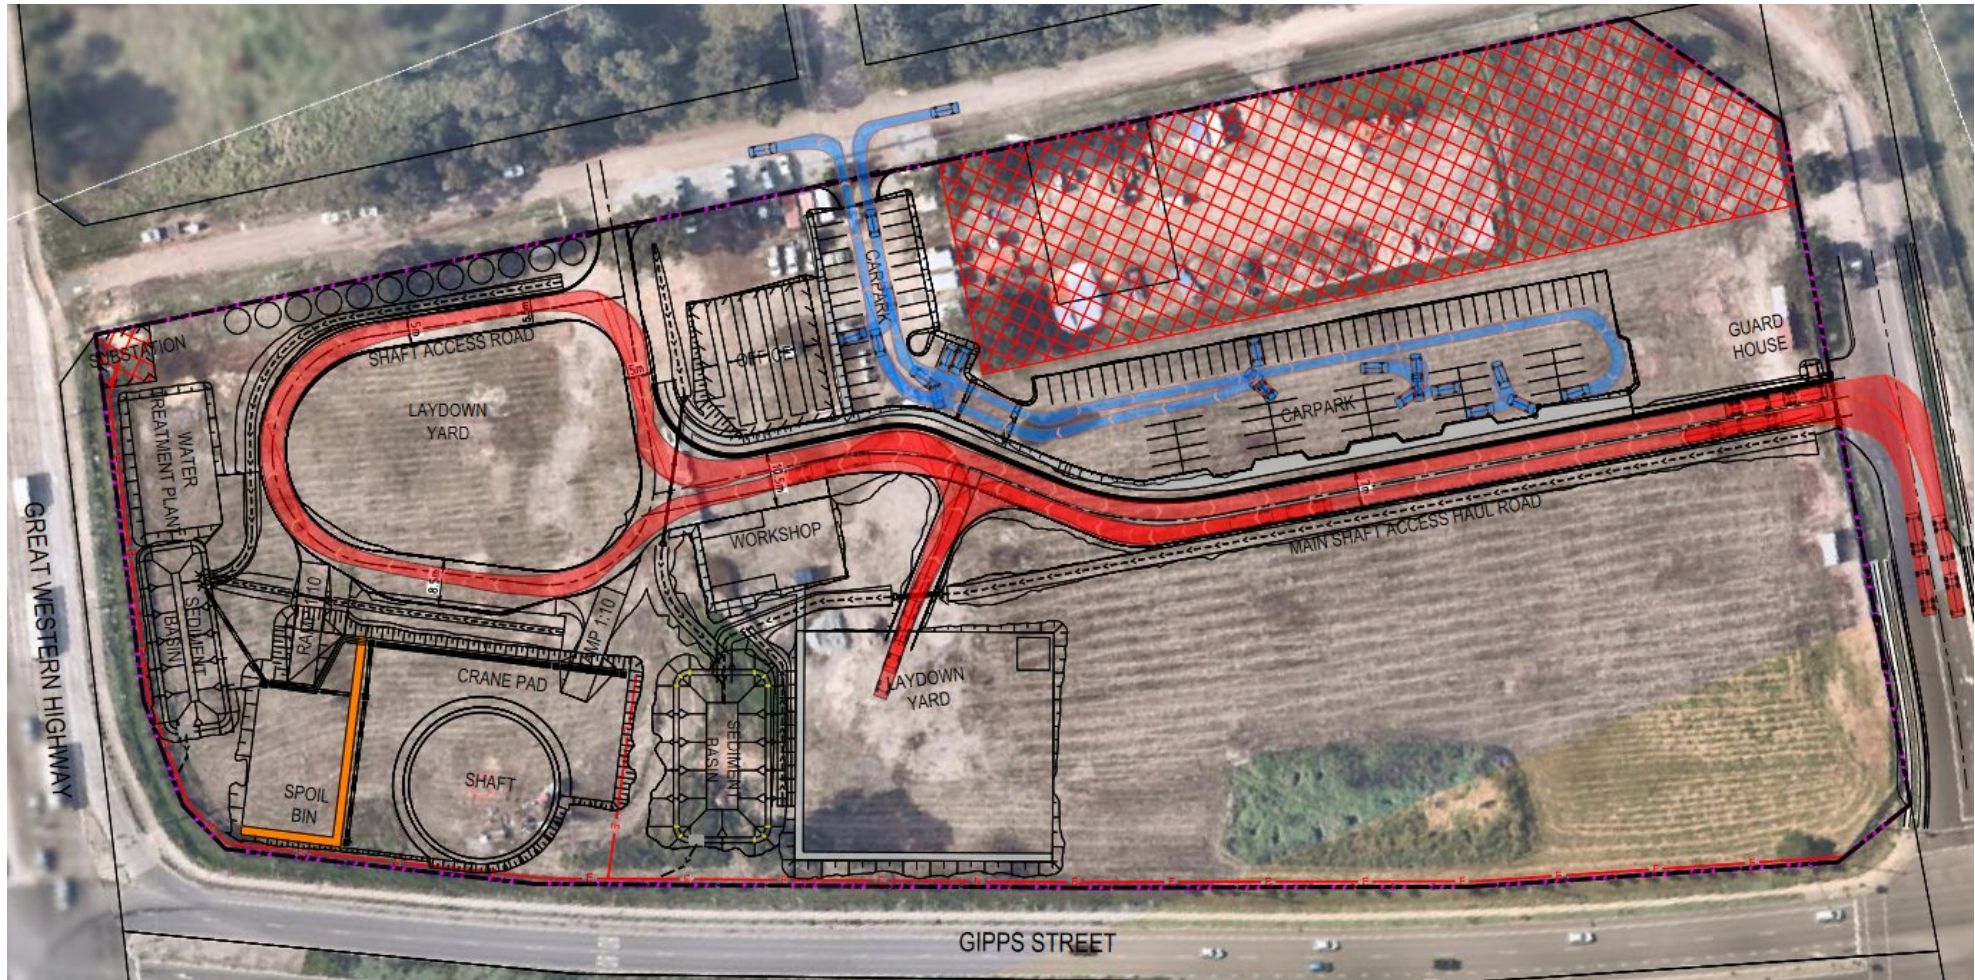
Claremont Meadows Site Layout Plan – SBT 2
